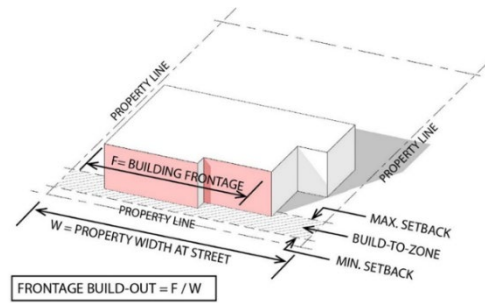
Image showing Building Frontage Build-out calculation
